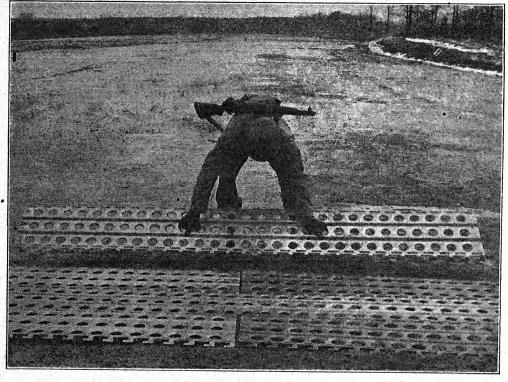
P.S.P. SHOWING PLACING OF A PANEL (ENGINEER BOARD, FORT BELVOIR, VIRGINIA)
